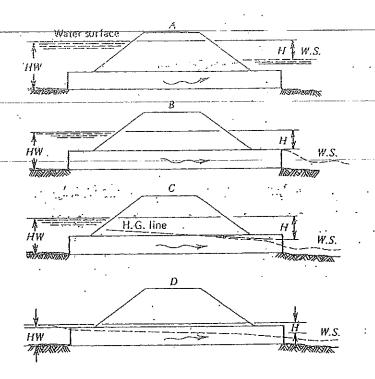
Outlet control for culverts. (Source: Hydraulic Design for Improved Inlets for Culverts, Federal Highway Administration, August 1972.)
